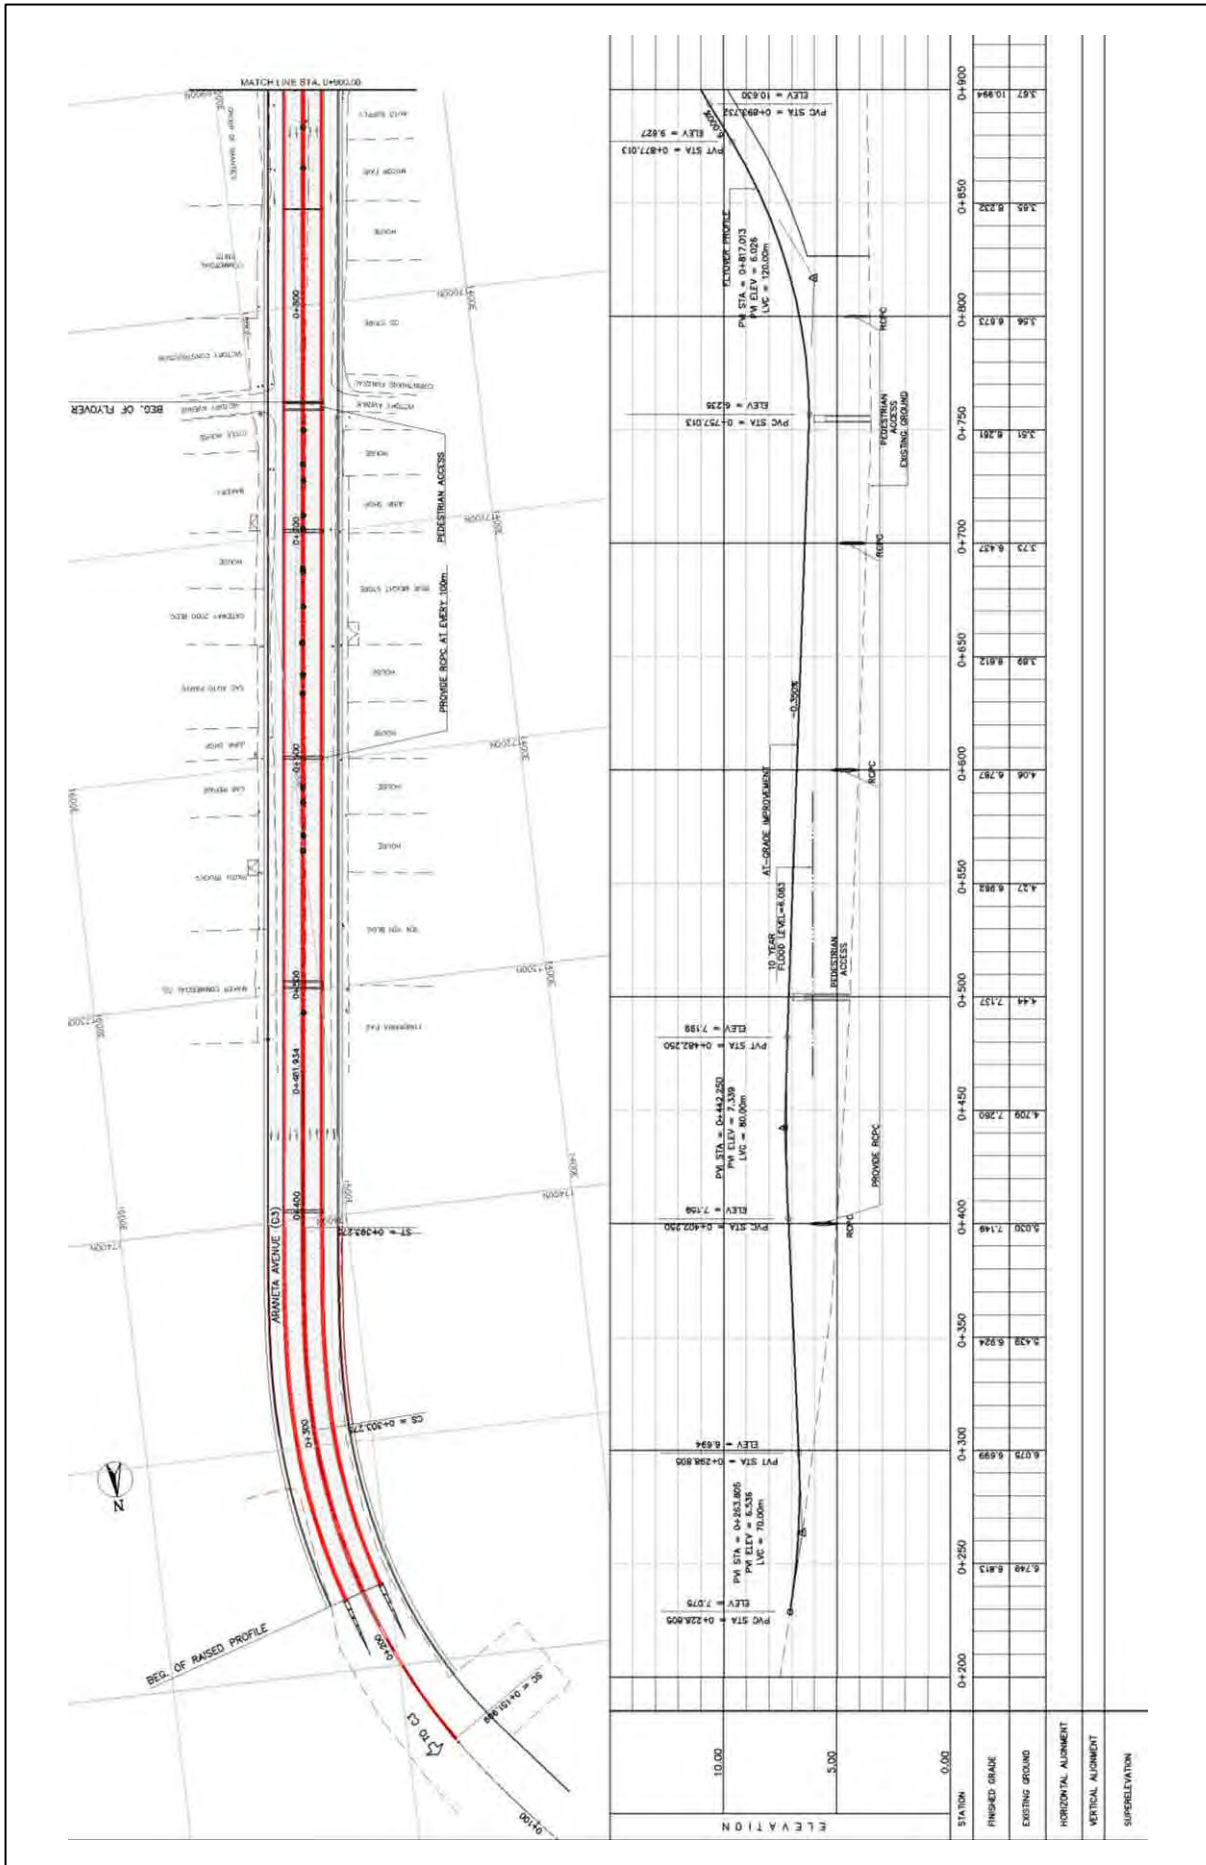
Plan and Profile C-3/E. Rodriguez Interchange (1/2)
